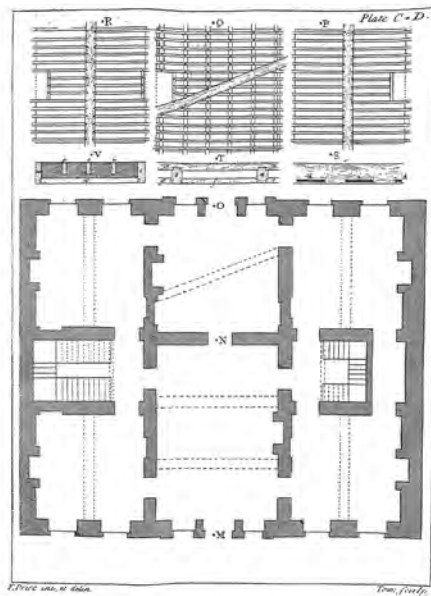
Floor joists (Price, 1759, 1733, Plates C and D).
